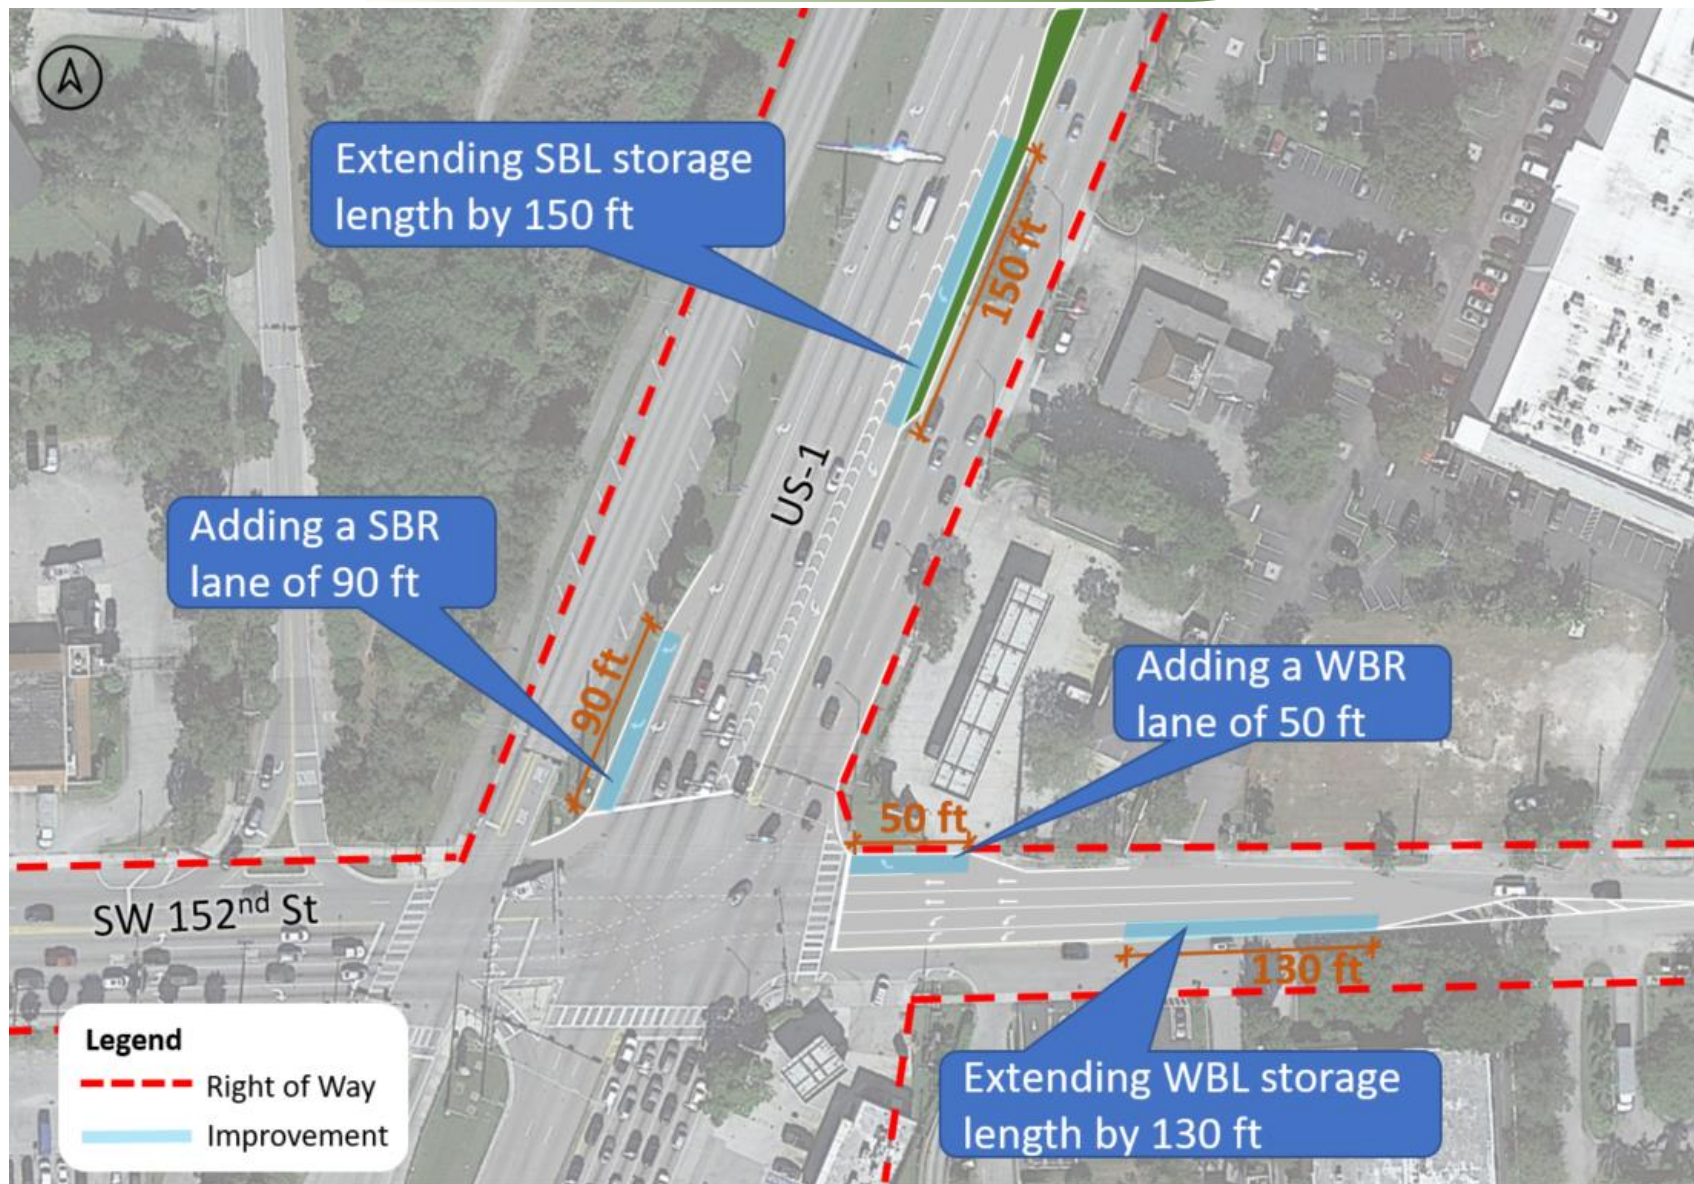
Conceptual Design Plan – US-1 and SW 152nd Street
